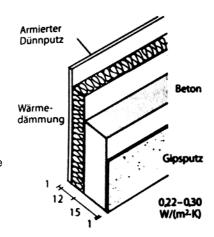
Examplary outdoor wall construction (source: Neufert 2016)
